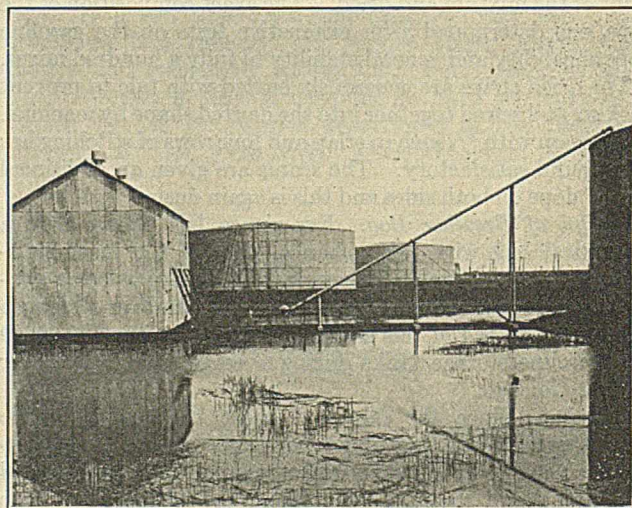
Gasoline Storage Tanks and Breather Bag House for 18,000-Cubic Foot Balloon
